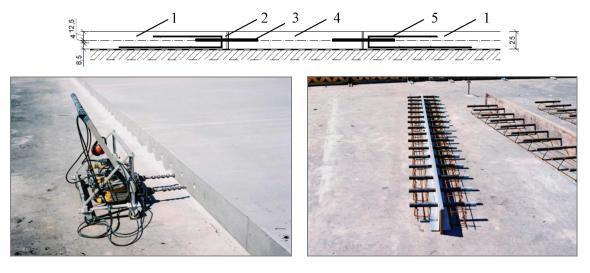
Detail of dowelled slab connection and a drill for openings, as well as prefabricated joint elements with dowels [own study, photo by A. Seruga]
